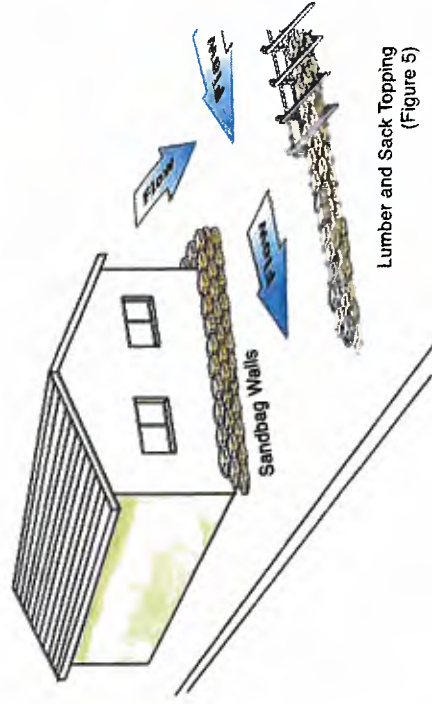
To divert mud, debris, and water, use sandbag walls or lumber and sack topping
